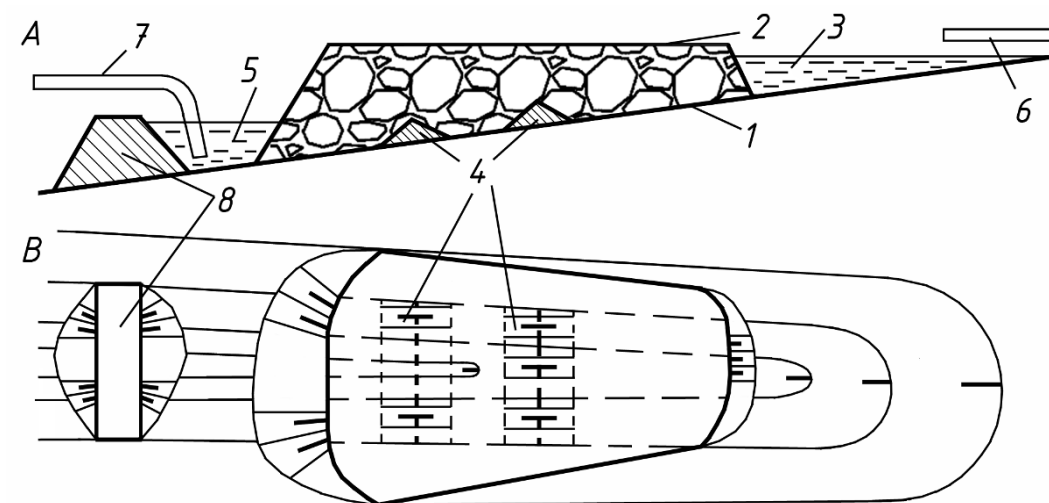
Construction of the filtering array with waterproof stopping: A – longitudinal section; B – plan view; 1 – the bottom of the filter; 2 – filtering array; 3 – receiver for contaminated water; 4 – waterproof stopping; 5 – lodgement of purified water; 6 – conduit for feeding for contaminated water; 7 – conduit for purified water removing; 8 – water retention levee.
